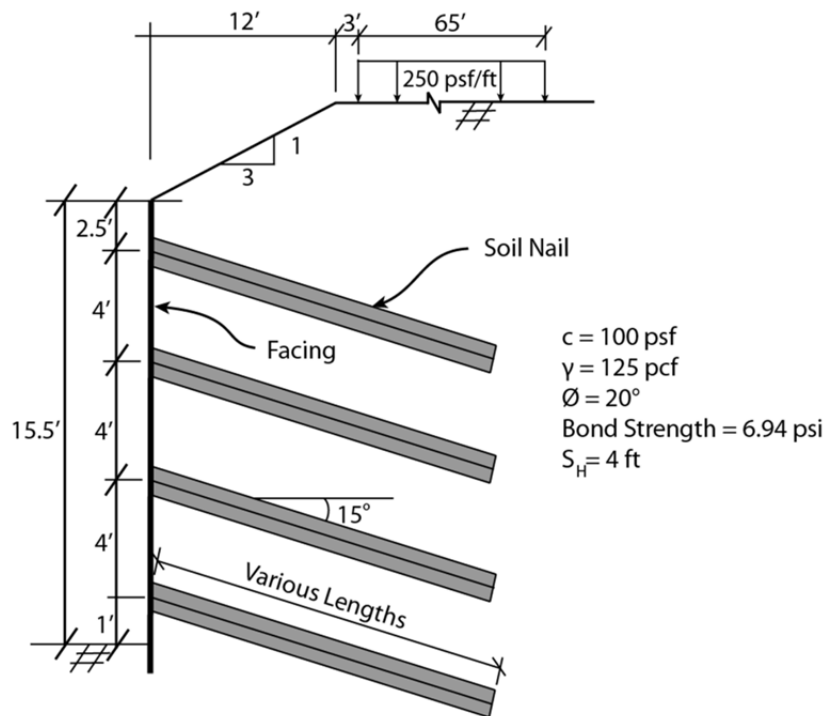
Soil nail wall layout 2 for comparison in SNAILZ.
